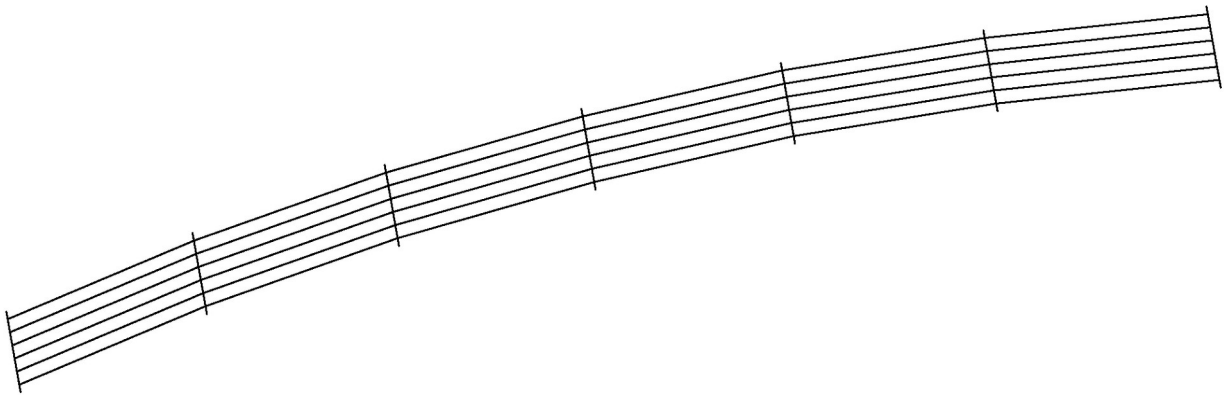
Simplified Framing Plan of Horizontally Curved Bridge
